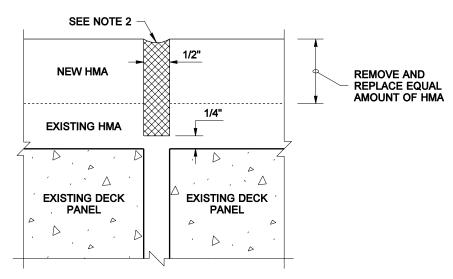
1" JOINT SEAL BRIDGE DECK WITH HMA OVERLAY
